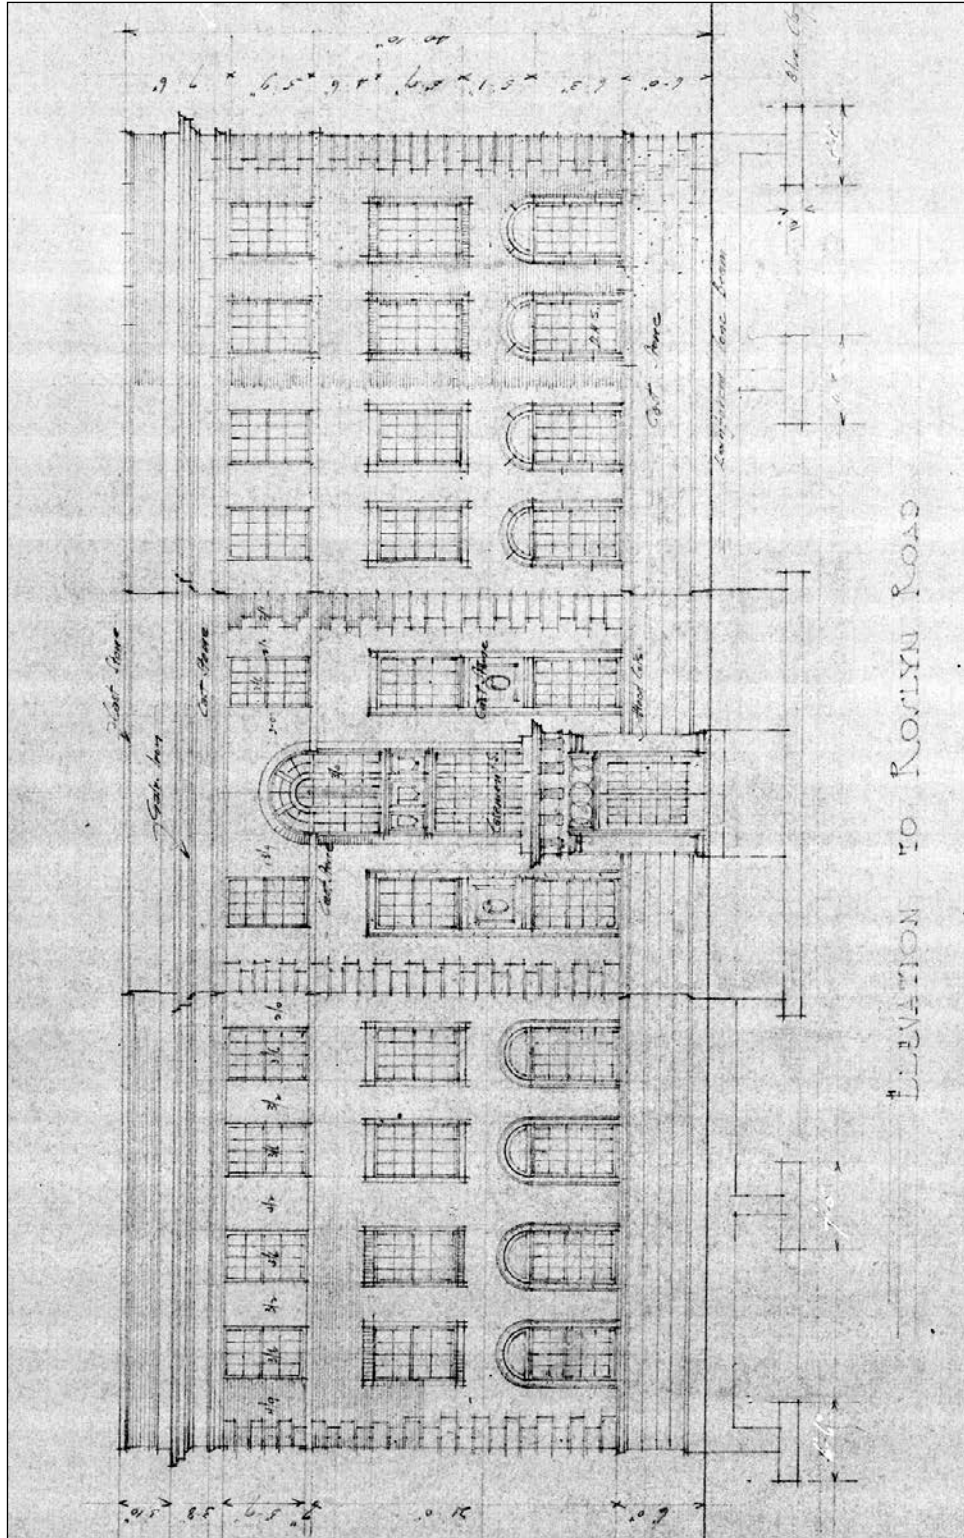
“Elevation to Roslyn Road,” architect’s plans, 1929. (City of Winnipeg, Plan No. 331/1929.)
